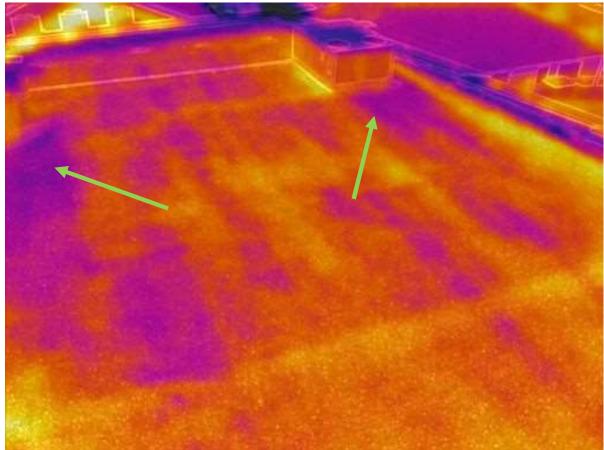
Drone IR photo displaying thermal tracing indicative of water in the roof system at R3
